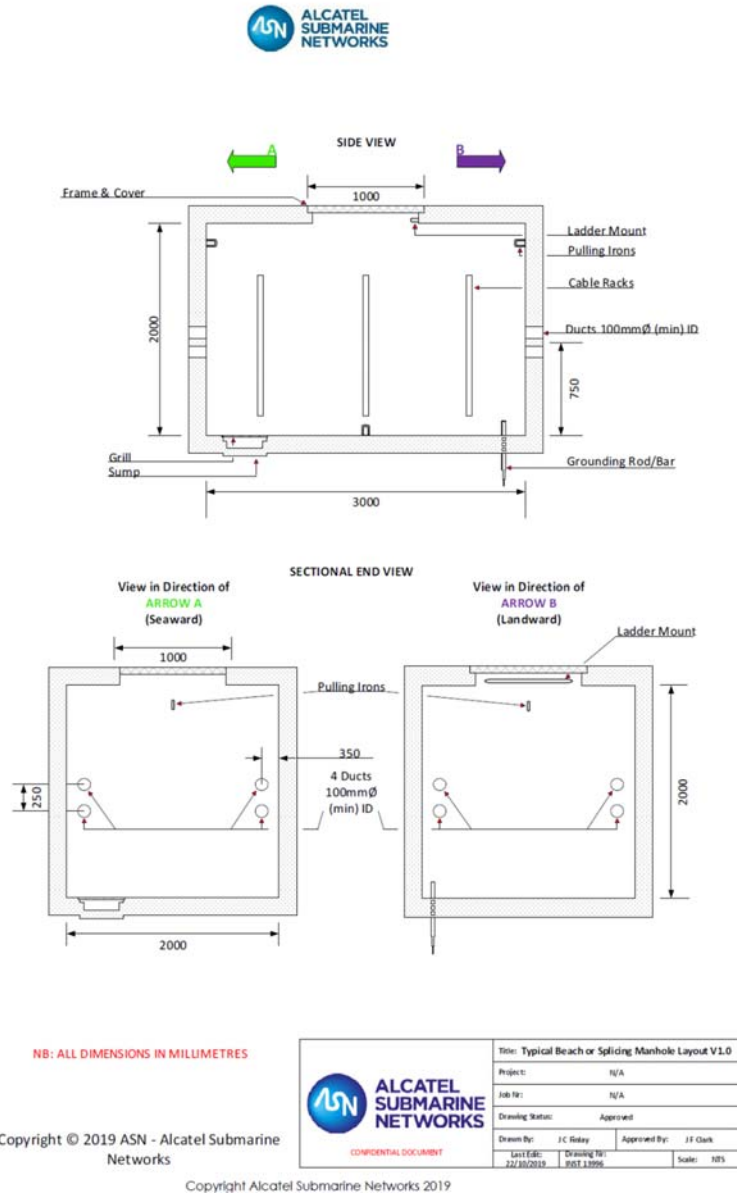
Typical Layout of a Beach Manhole (ASN, 2019)
